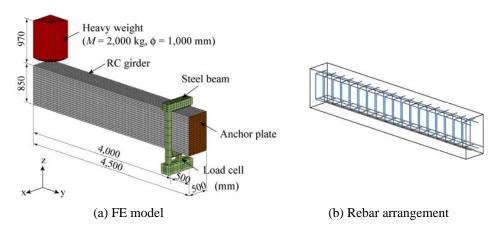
Full-scale numerical setup model of falling-weight Impact test
